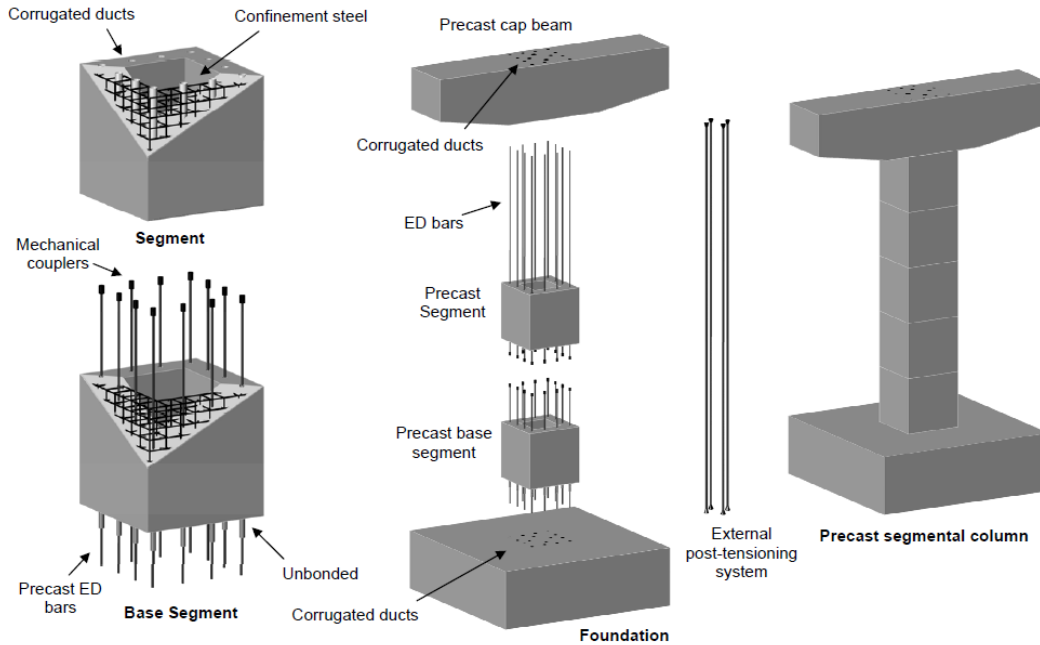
Precast segmental column proposed by Yu-Chen (2007)
